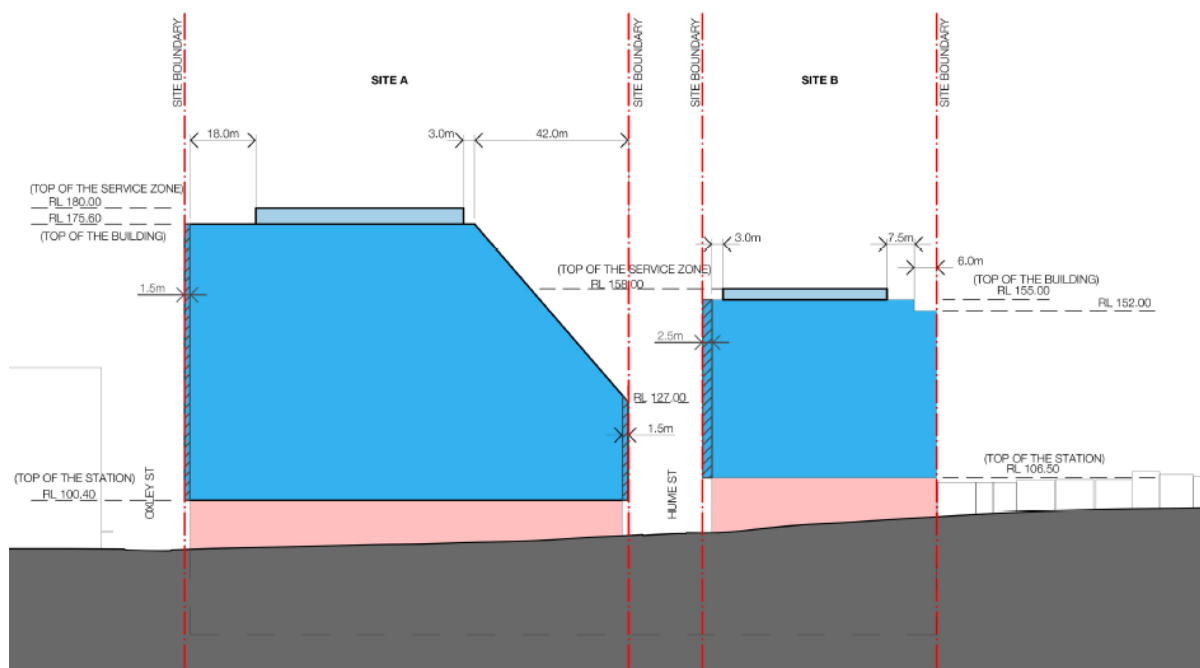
West elevation of the building envelope under the Amended Scheme, showing CSSI Approval (pink) and OSD components (blue)
